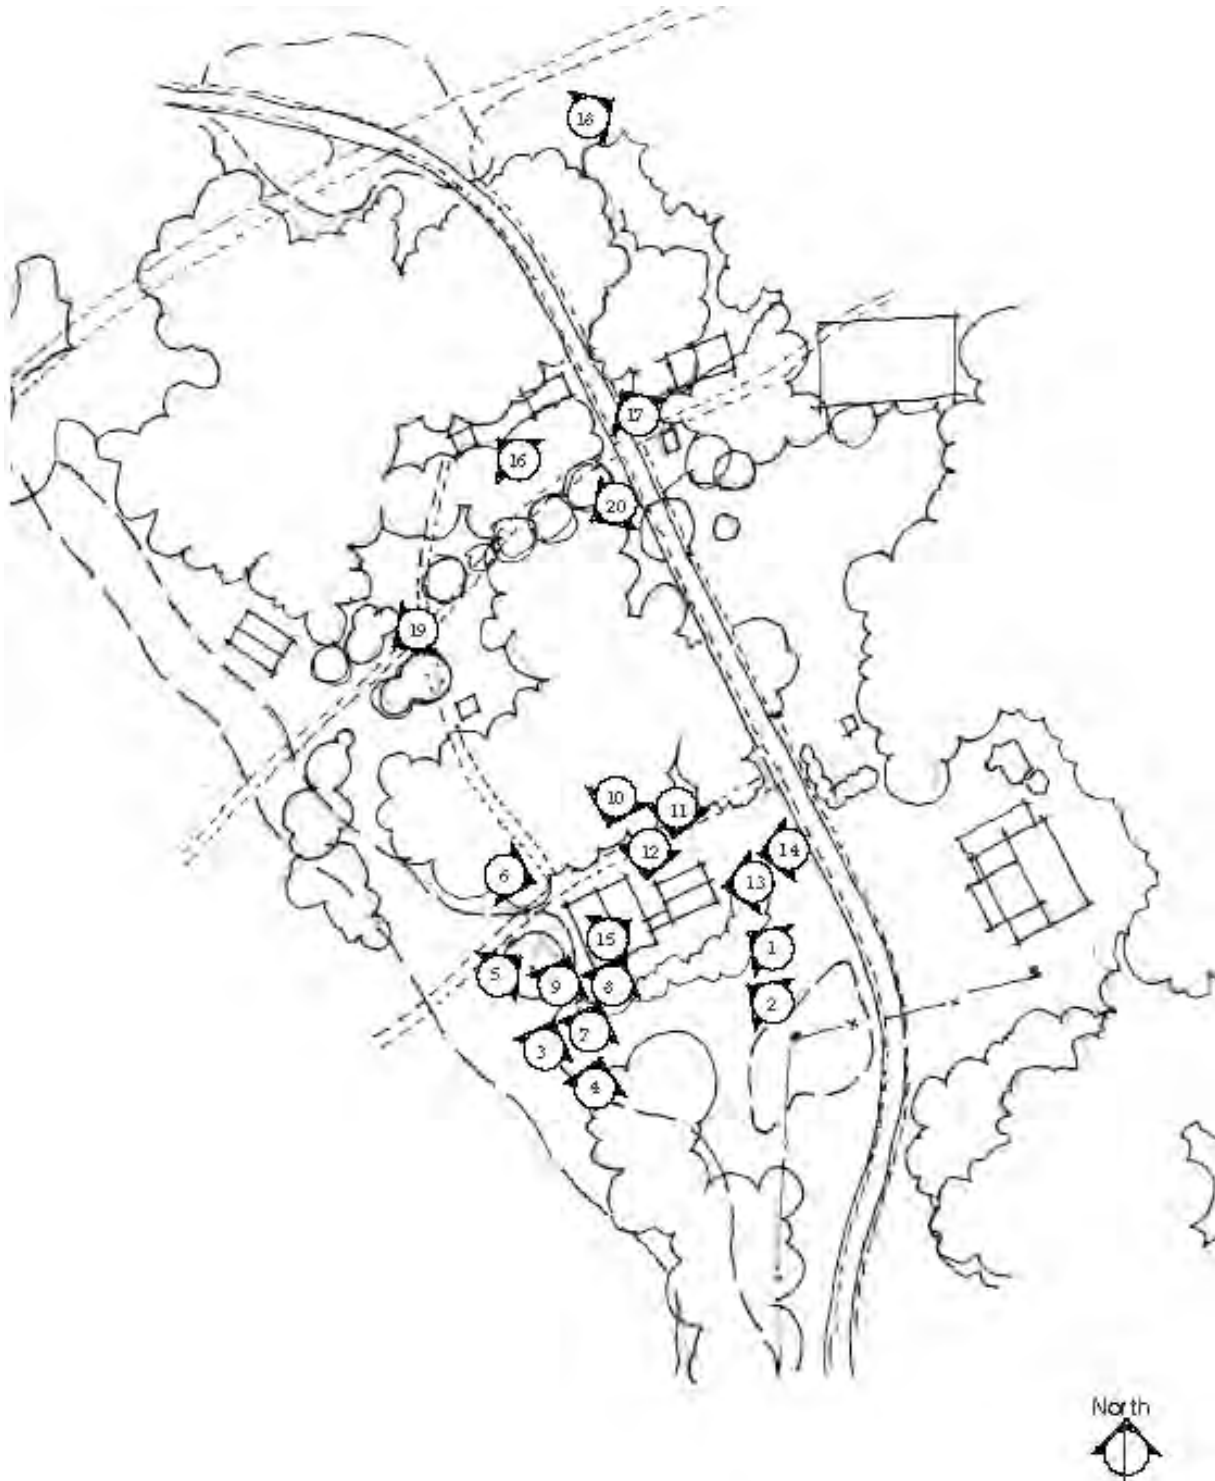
Close-up site plan sketch proximate to log house, with photo standpoints indicated
